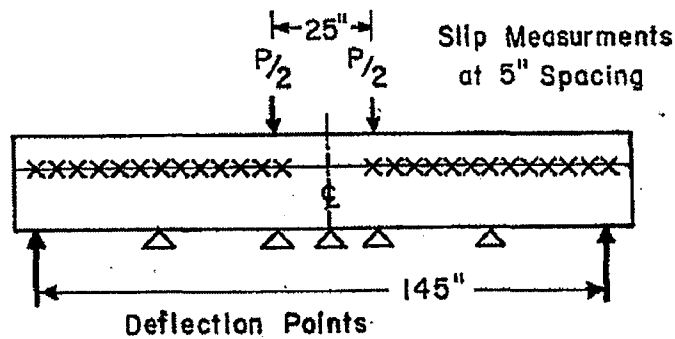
Elevation View of Test Setup for Hanson's Tests
